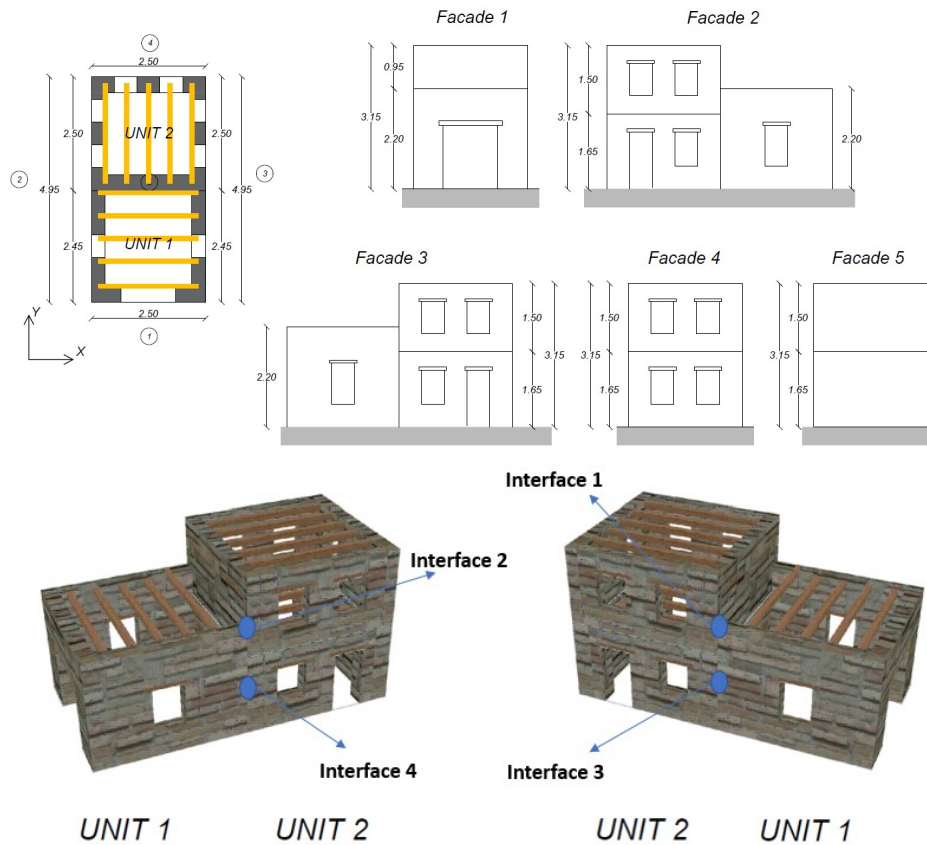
Case study: Floor plan layout of the two units and 3D view of the test unit with the positions of the interfaces.
